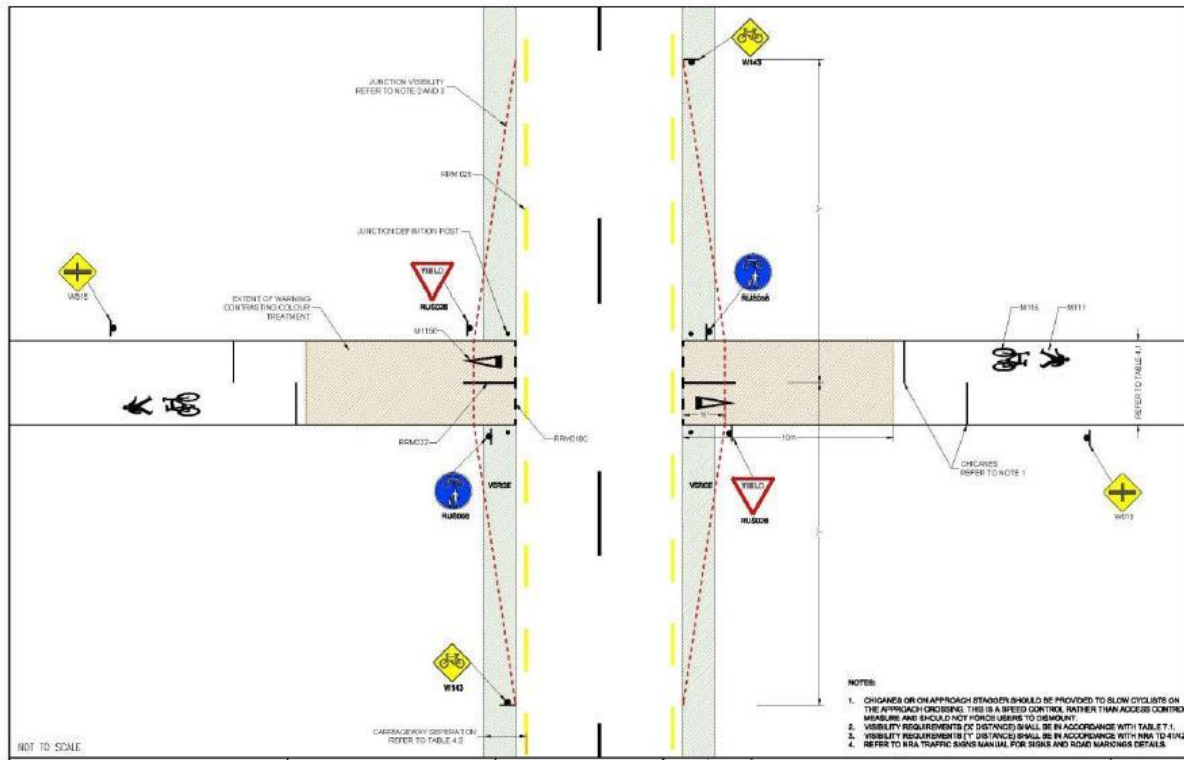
Trail Crossing at Minor Road - TII’s 2017 ‘Rural Cycleway Design (offline)’:
